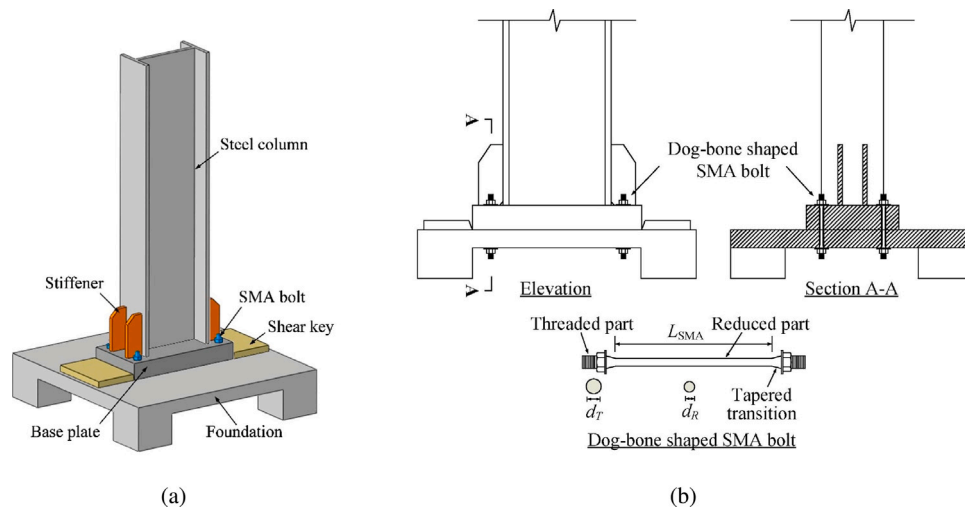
Schematic of steel column and foundation connection with SMA bolts; (a) configuration; (b) cross sections [179].
